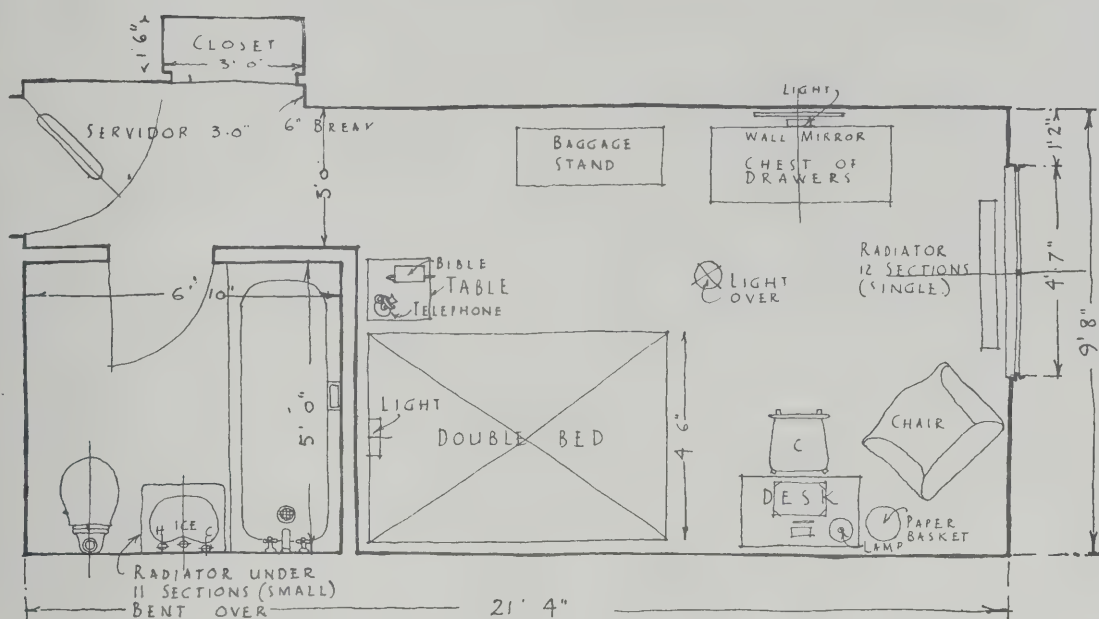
THE PENNSYLVANIA HOTEL, NEW YORK: LAYOUT OF THE FURNITURE IN A TYPICAL SINGLE BEDROOM AND BATH.
